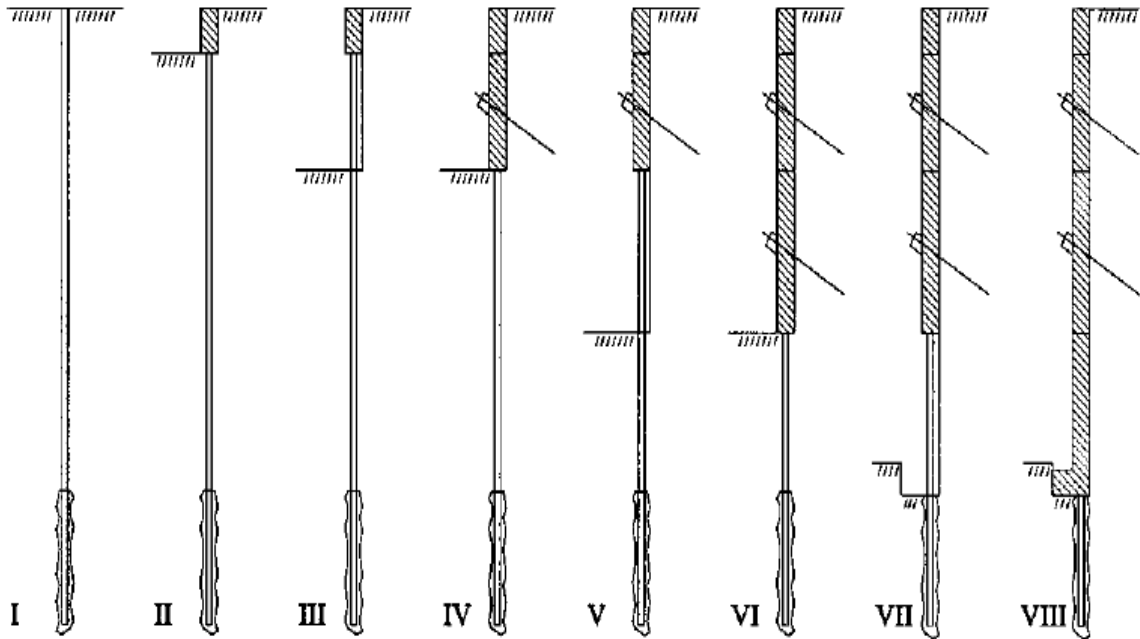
Construction sequence of an anchored concrete soldier pile retaining wall
